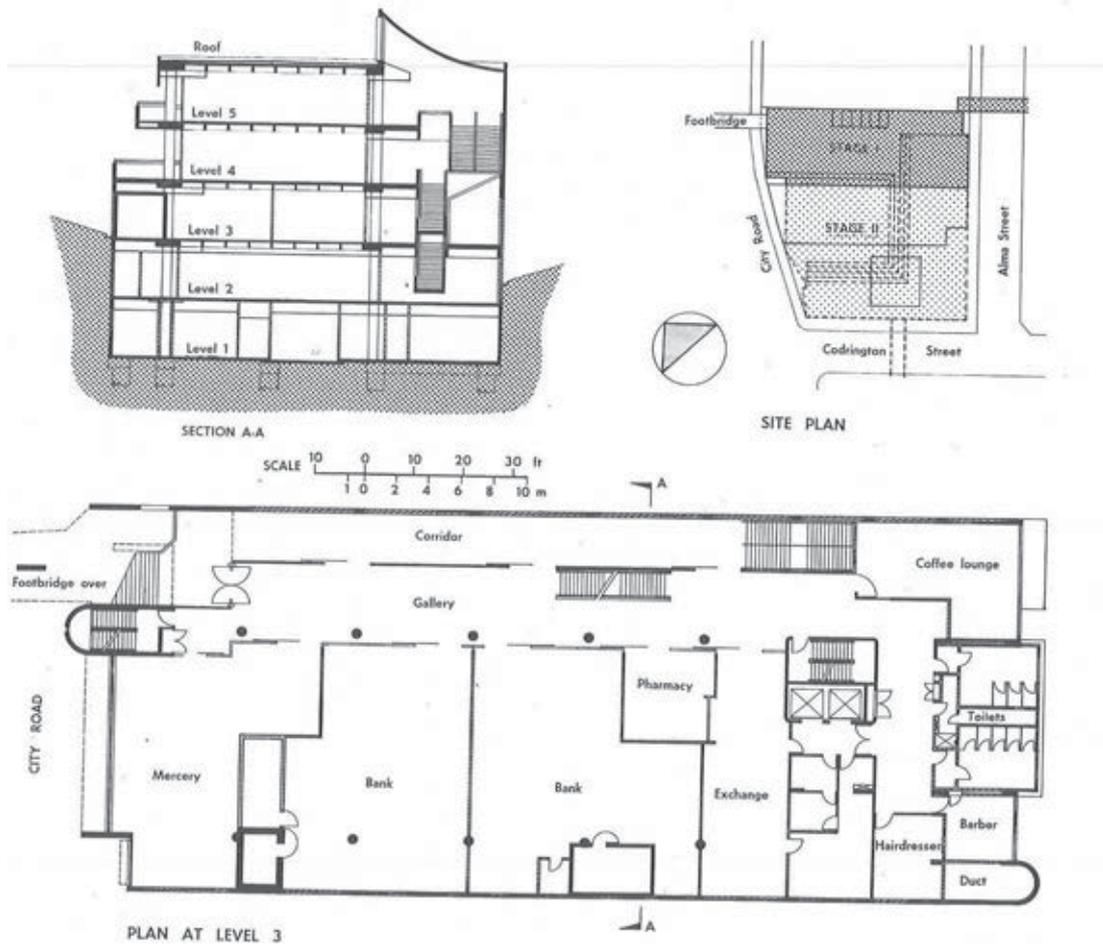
Sectional drawing, site plan showing proposed staging and Level 3 plan of the Wentworth. The plan indicates the variety of facilities on offer in the building.
